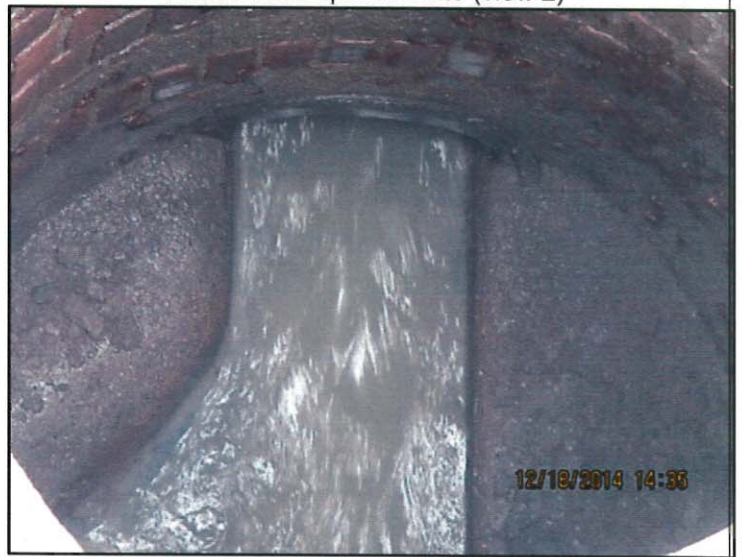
Manhole and sewer line inspection and trunk line on right with high flows
